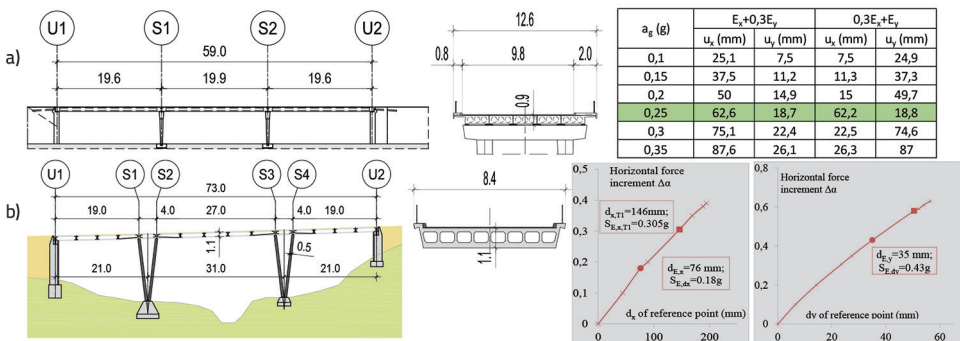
a) Prestressed girder bridge: Longitudinal layout, cross-section and displacements of bearings
